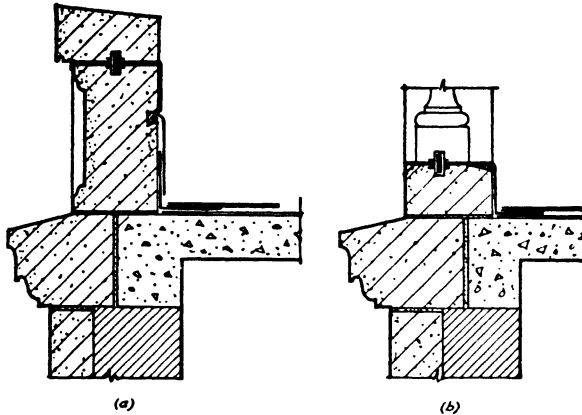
Stone Parapets and Balustrades. (a) parapet; (b) balustrade.
